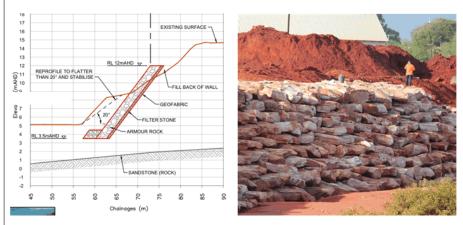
Typical section of Option 2 (left) and example high crested revetment (right).
